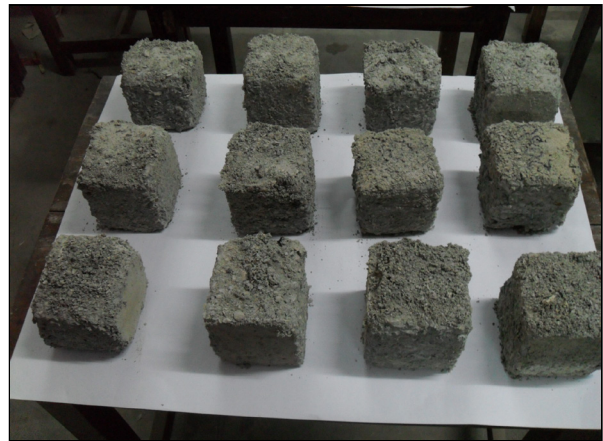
FA Concrete specimens after 180 F-T cycles in SW
